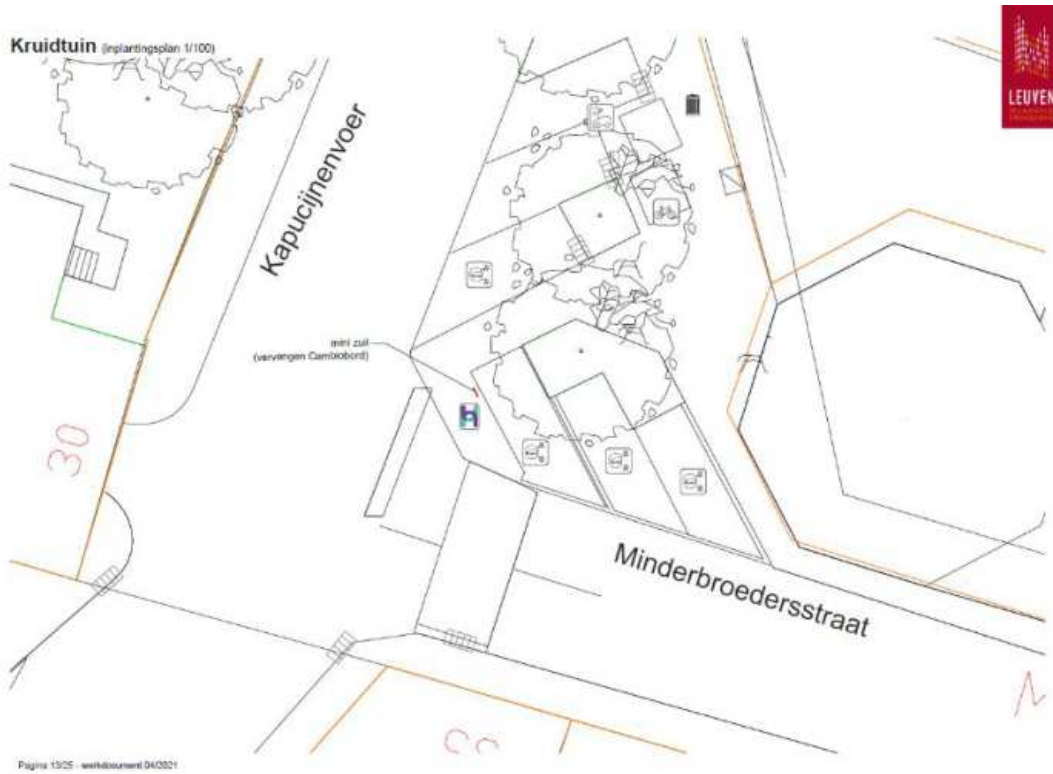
June 2021 – Site plan information pillar of eHUB Kruidtuin, implemented since June 2021
